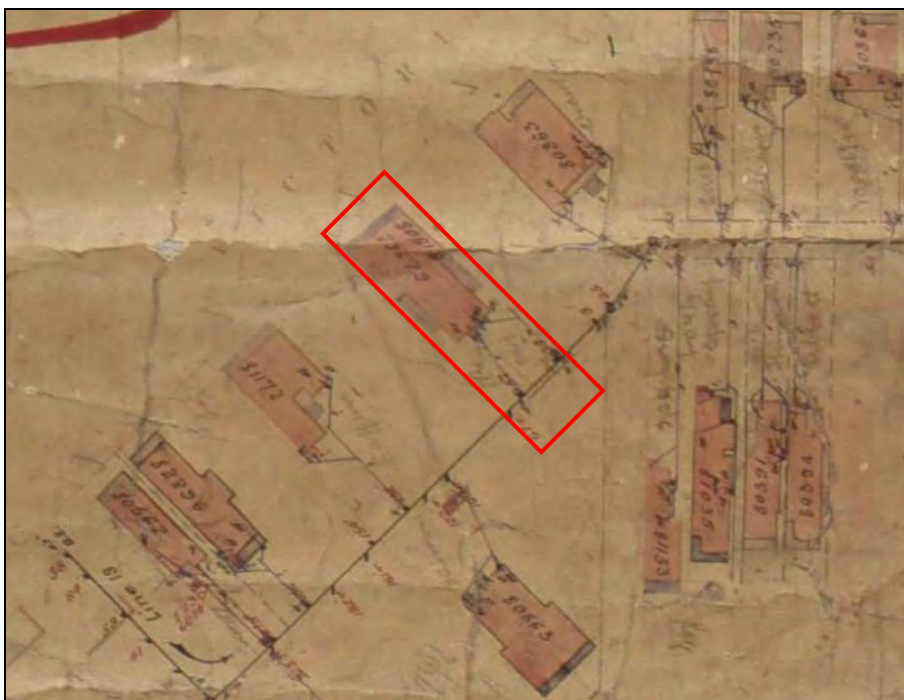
Detail of the c. 1900 Sydney Water plan.
